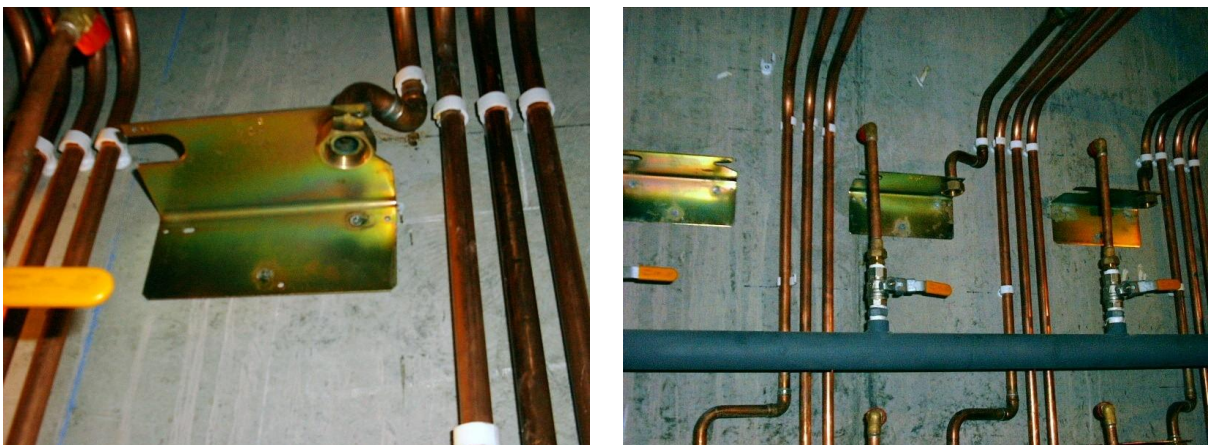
/11 Pictures shows pipe run (from apartment) to right hand slot of meter bracket.
